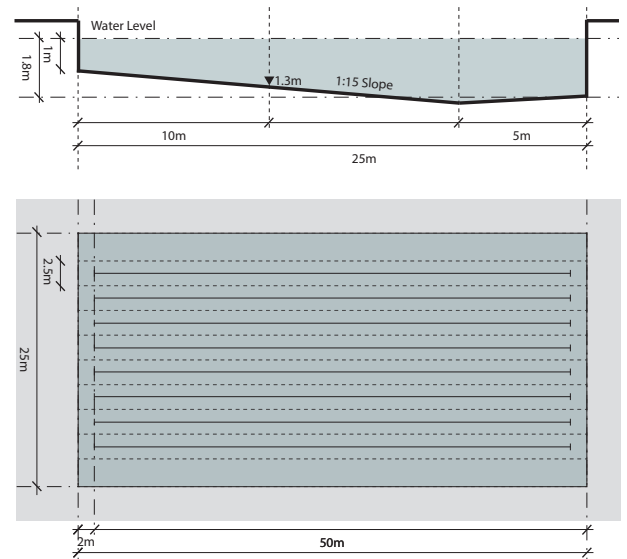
Typical 25m Pool Section (Source: Metric handbook)
